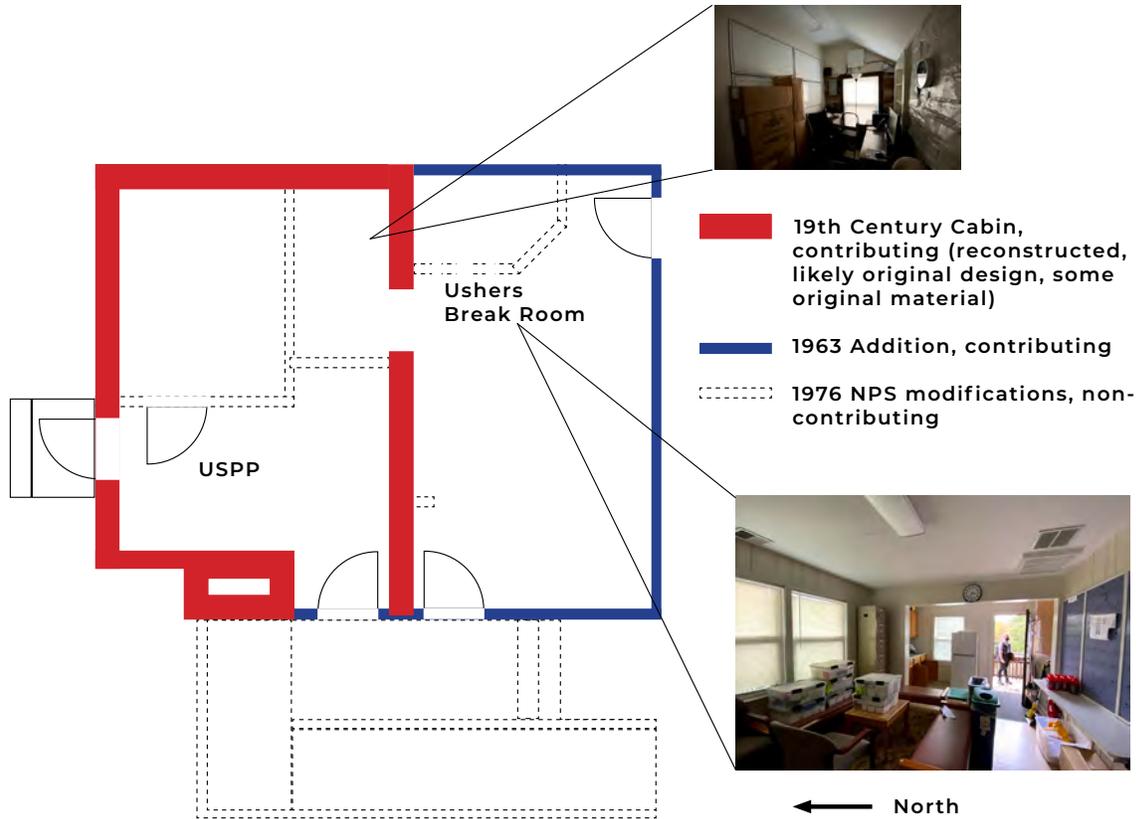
Existing Cabin floor plan diagram showing era of construction.
